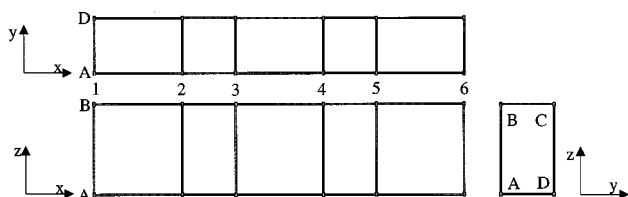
Plan view, side view, and cross section of *rectangular truss*.
